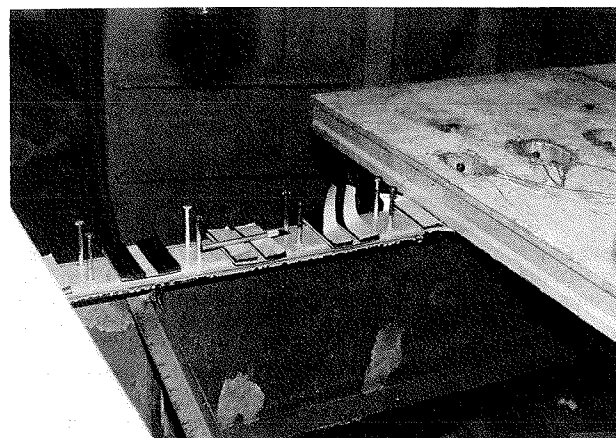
Peel-back foam insulation used to dam epoxy mortar and as bearings for precast panels.
